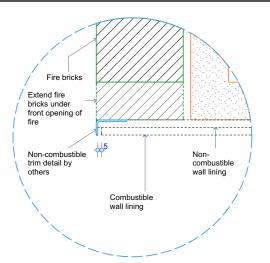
Plan View Fire Surround Opt. 1 Timber Cavity
